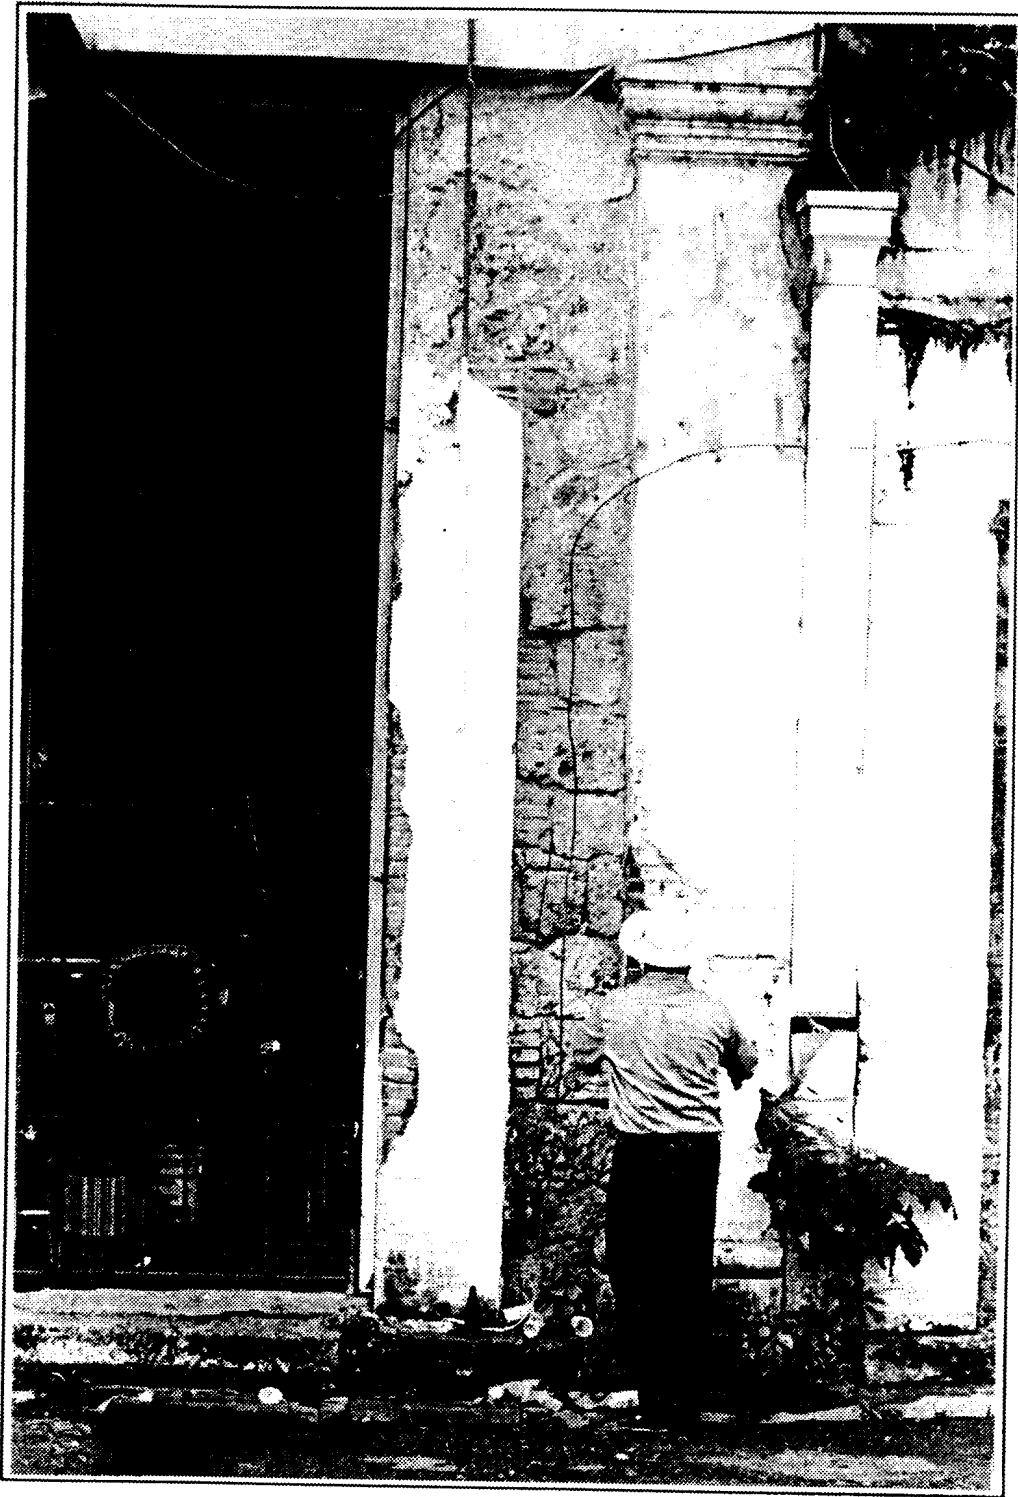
Architectural details of Structures 1 and 2, Area 2. View towards the east.
